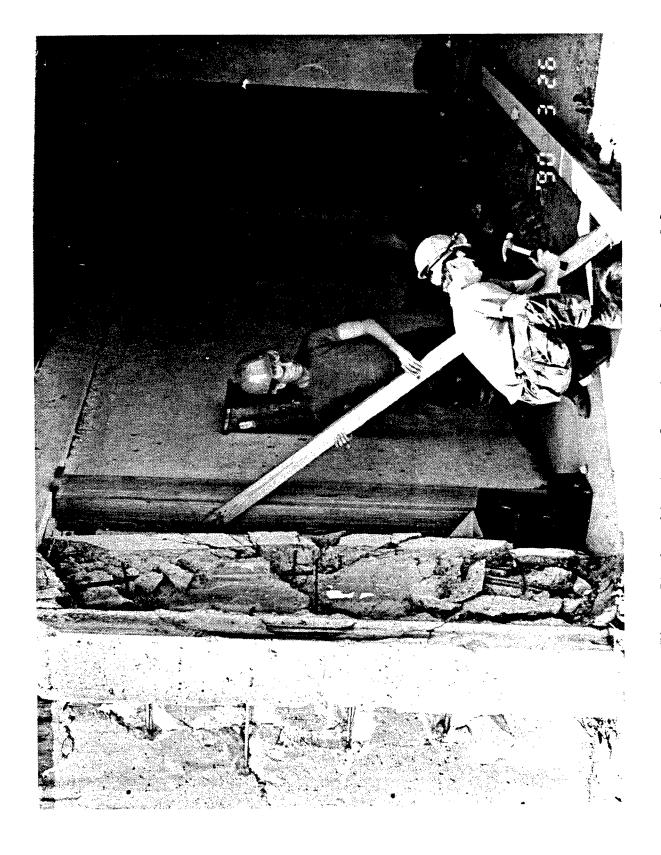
Removing Shoring Jack to Complete the Repair Process.
